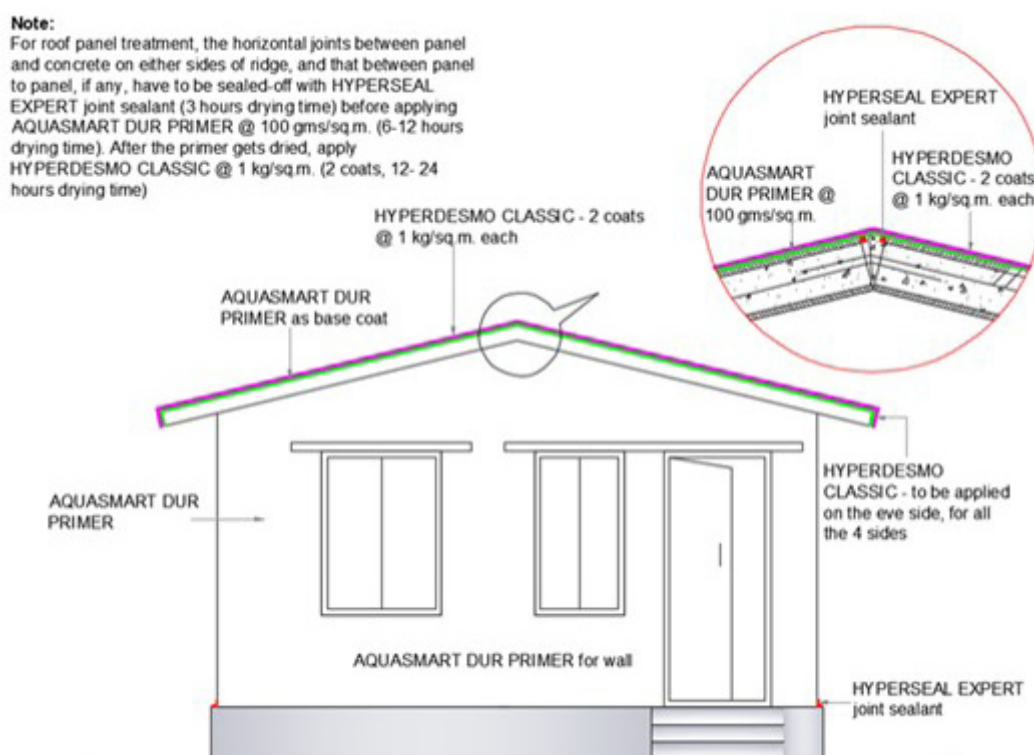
Waterproofing of GFRG house with sloped roof for rural / urban poor
